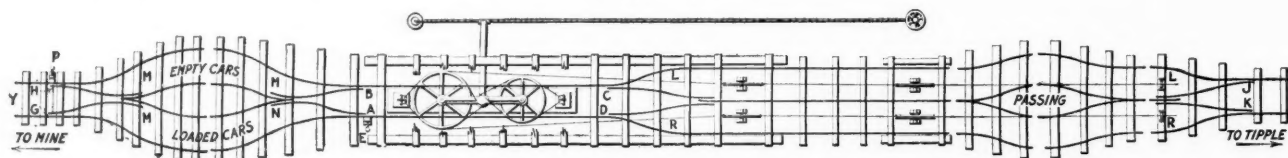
PLAN OF A 3-RAIL INCLINED PLANE
